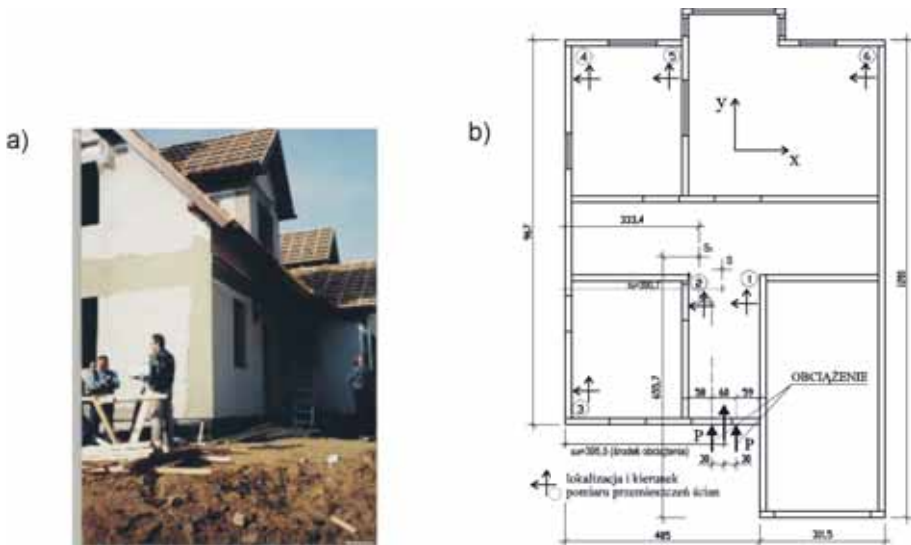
Tested house (Malesza et al. 2002): a) view, b) plan of ground floor
